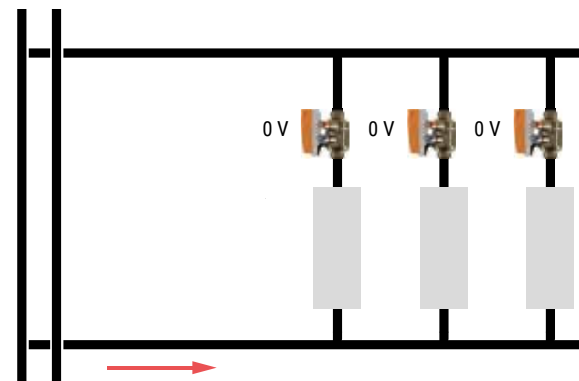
PIQCVs instead of a control valve and balancing valve combo
